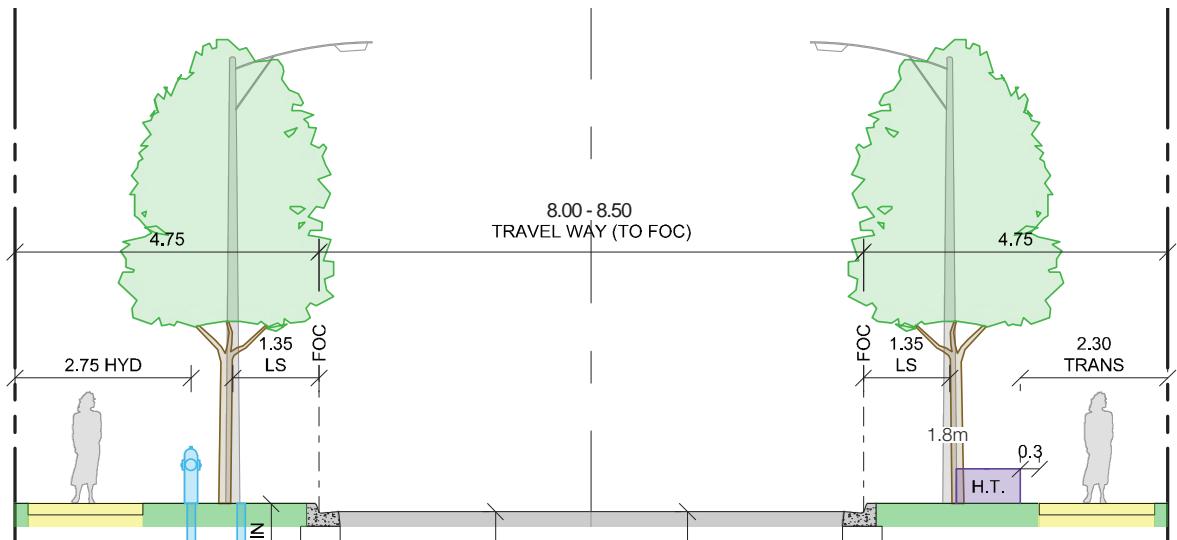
18.0m local road with sidewalks on both sides (8.0m to 8.5m pavement width)
